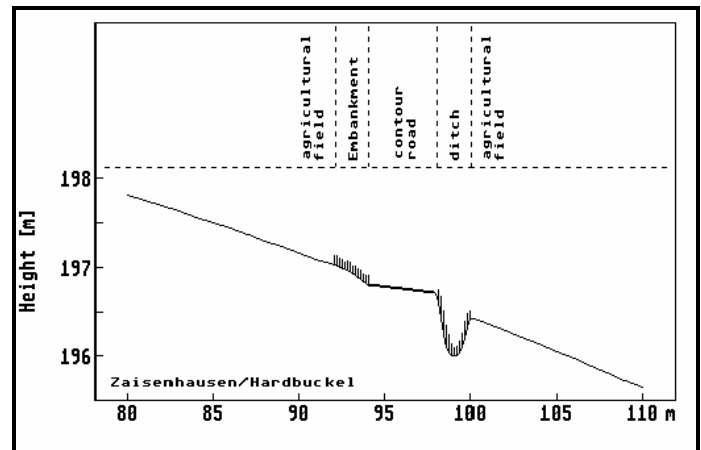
Principal layout of a contour road with diversion ditch (Schmidt, J., 1996, p. 114).
